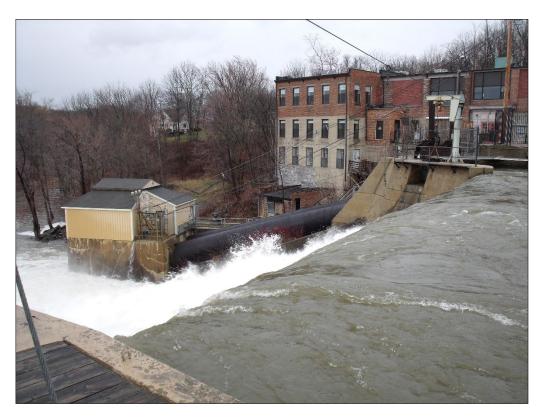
Plant 9B Intake, Penstocks, And Powerhouse
